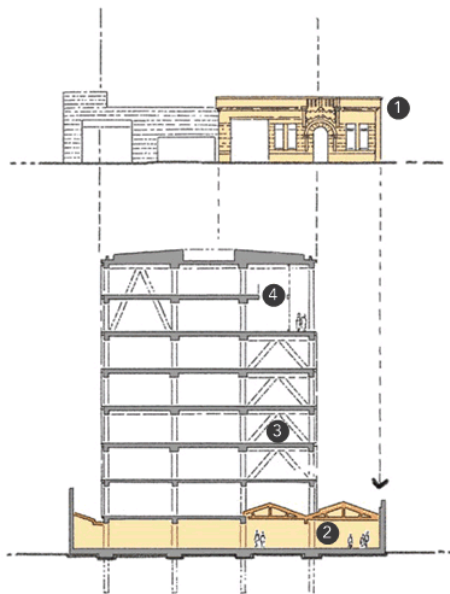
The new building retains the facade of the heritage warehouse at 89-93 Cimitiere Street and reuses some of the structure, including the expressive wooden trusses.
